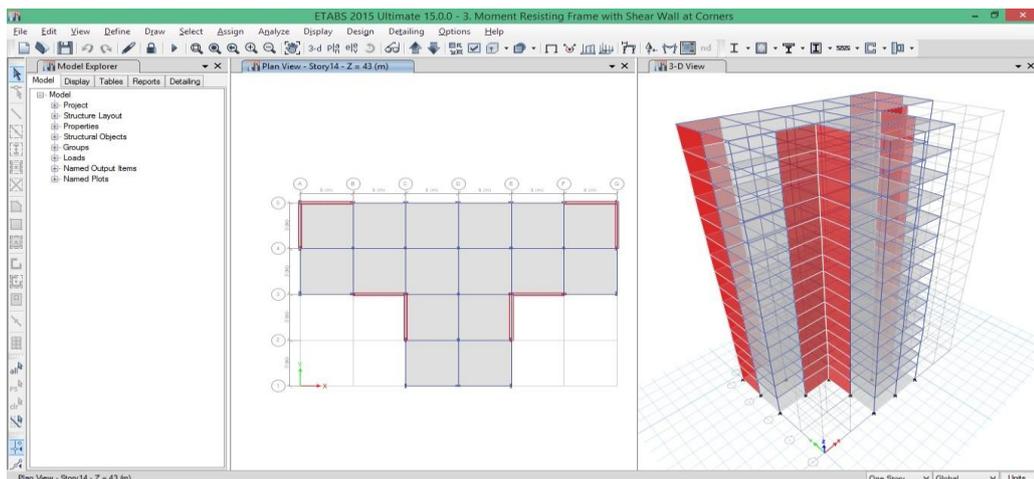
Plan & 3D view of Model-3 (Moment resisting frame with Shear wall – MRSW)
